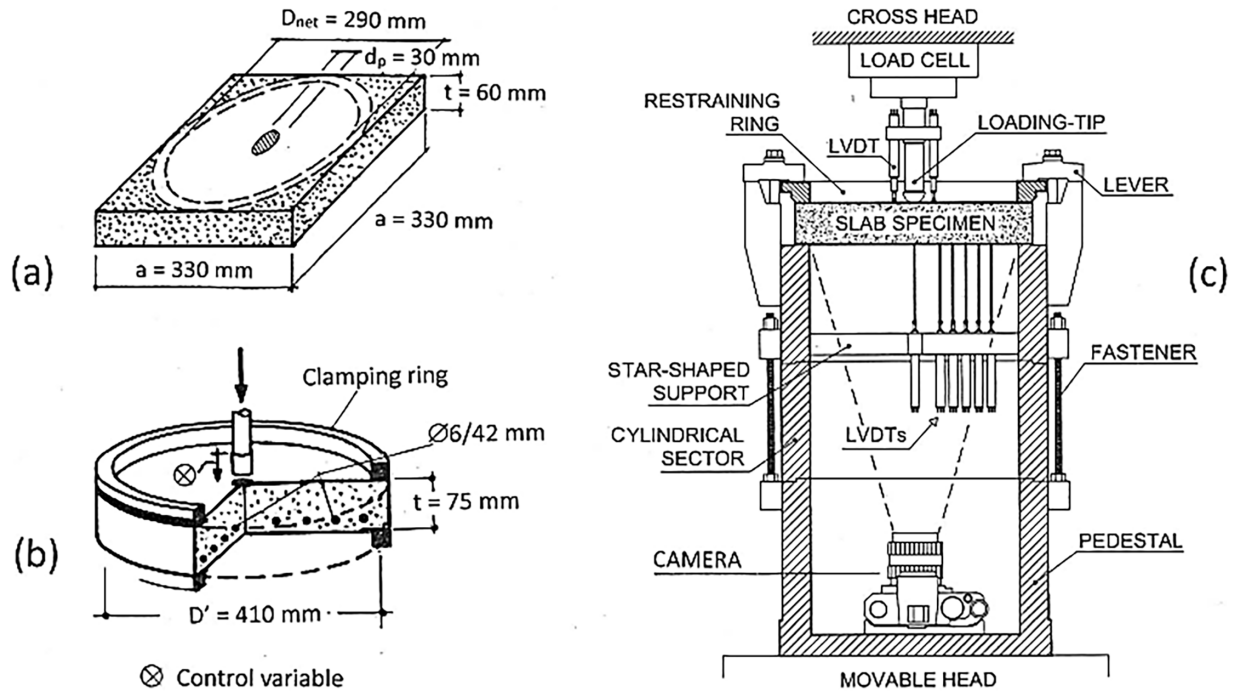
Specimen geometry and test setup: (a) Test Series A and C; (b) Test Series B; and (c) loading setup.
